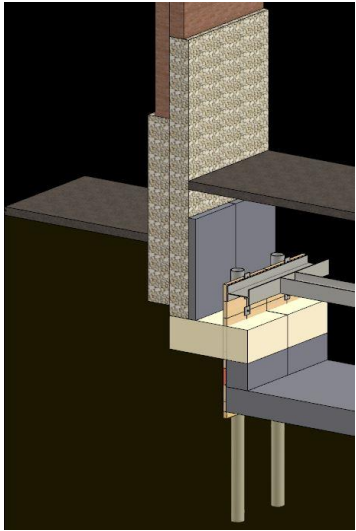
Western Portion of the 1826 Building Proposed Townhouse Underpinning Section
